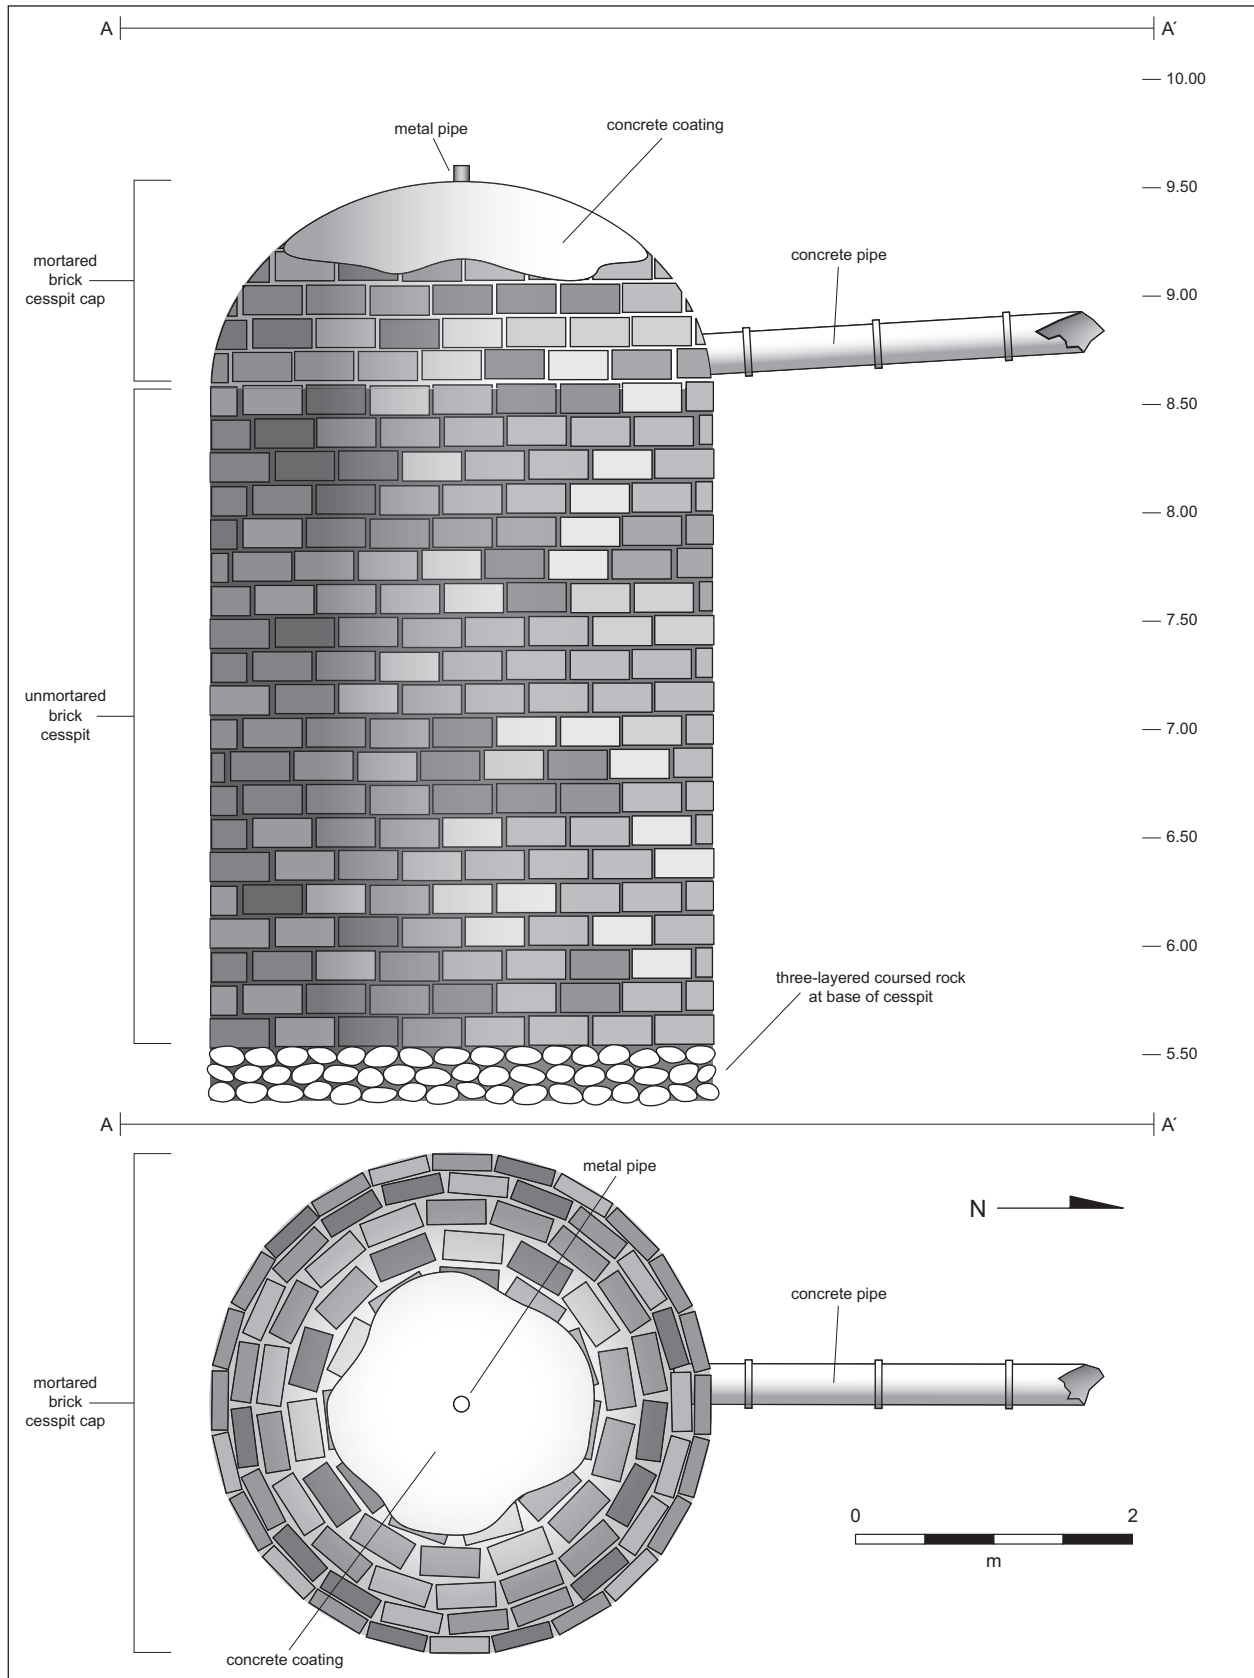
Structure 11, Feature 382, a straight-line cesspit privy plan view and profile.
